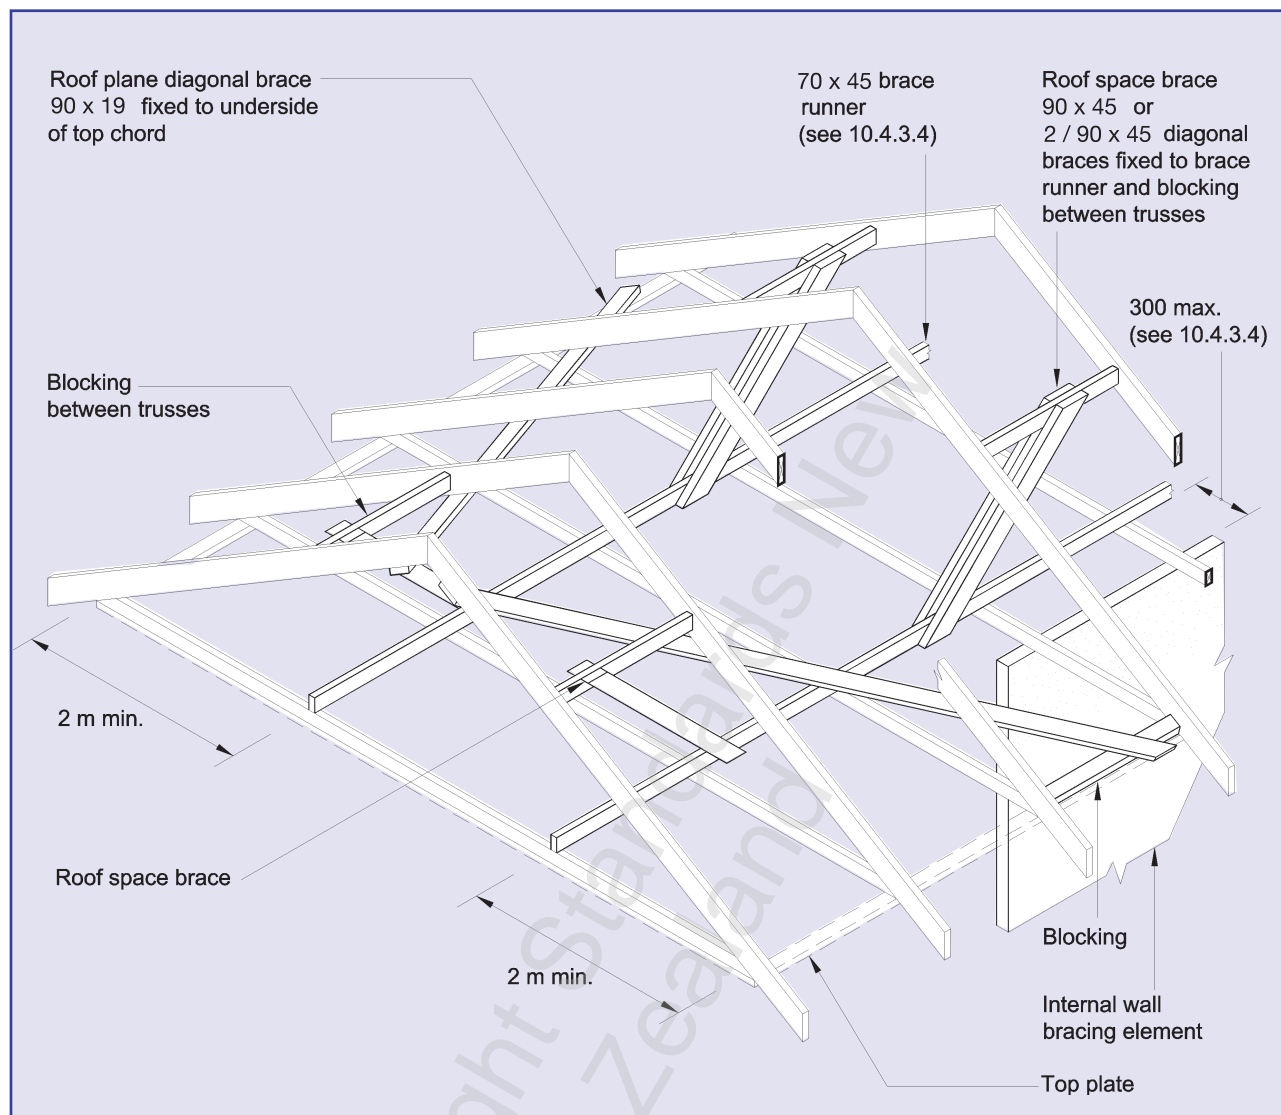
Bracing of heavy gable roofs (see 10.3.5)
